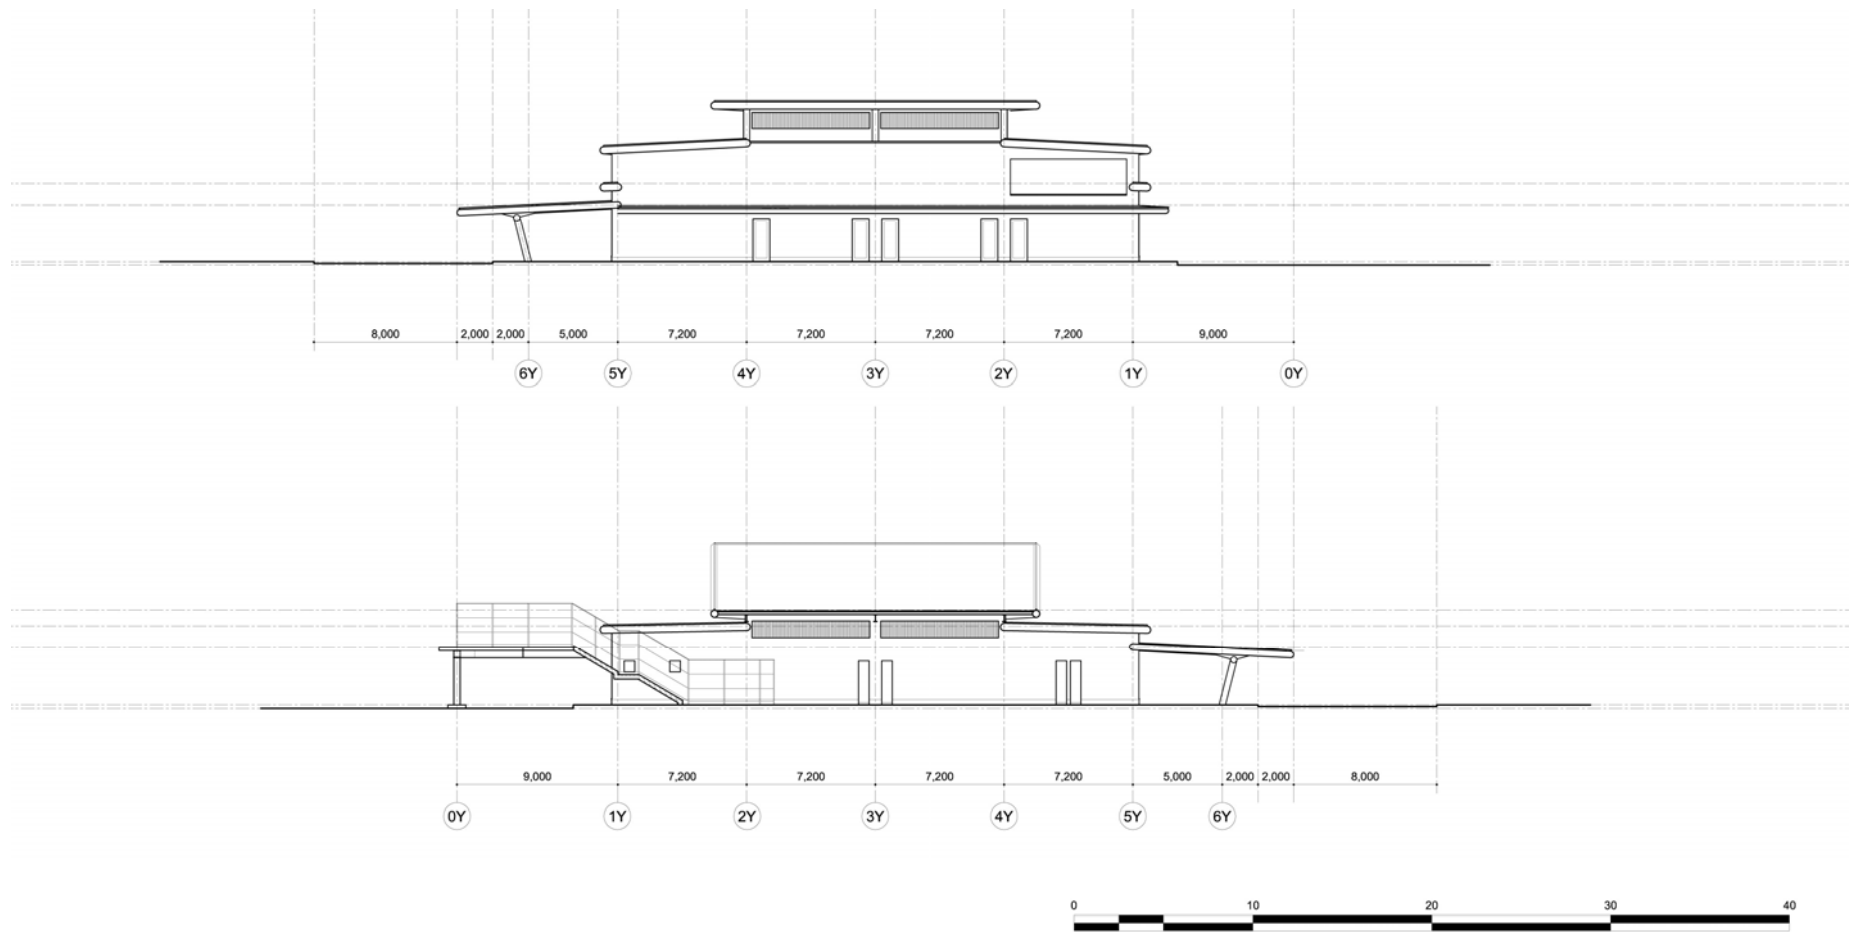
Elevation -2 (IDT) (Up: West side, Down: East side)
